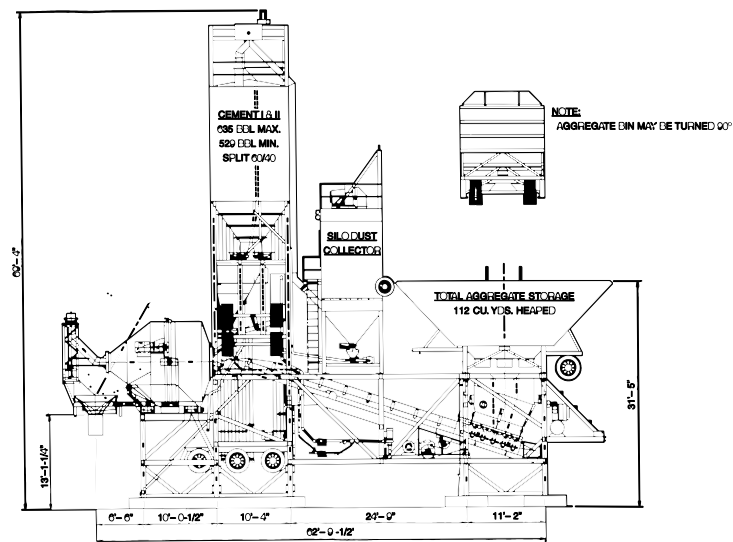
A low profile wet concrete mix plant (Concrete Equipment Company 1999).
